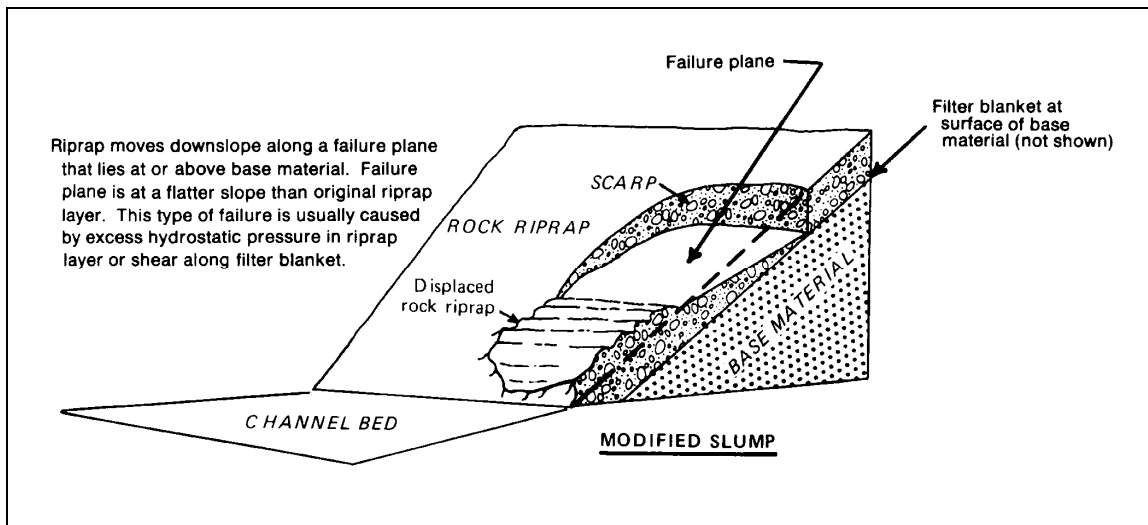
Riprap failure by modified slump (Blodgett and McConaughy 1986).
